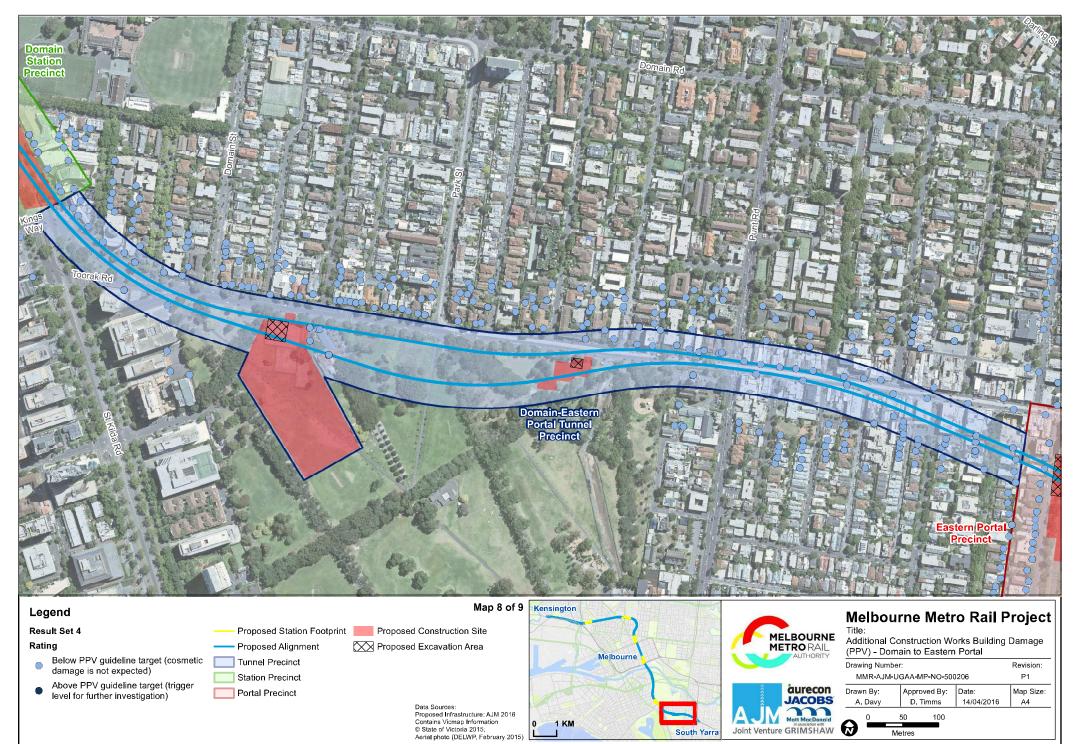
Colour coded building damage assessment due to Additional Construction Works – Domain to Eastern Tunnel Precinct
